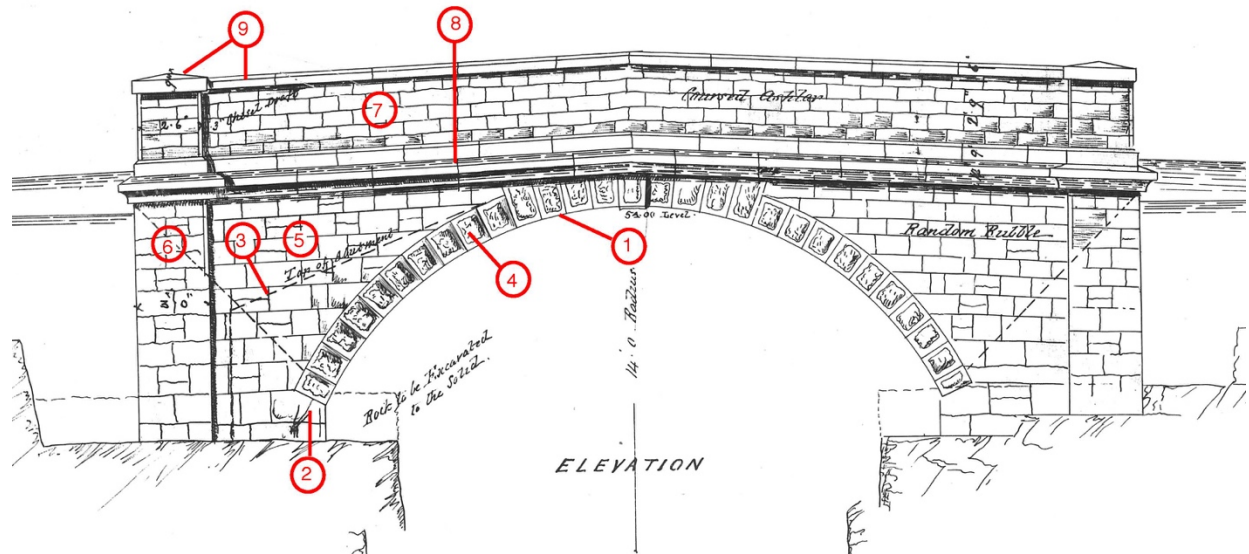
Elevation for Bridge over Aqueduct at Bridge Street dated January 27, 1873, annotated to illustrate the various existing stone elements.
